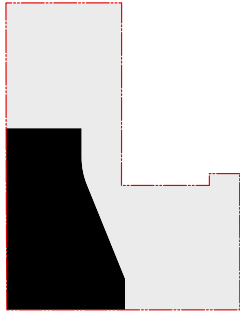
Southwest Quadrant Parking Plan – Level 1
